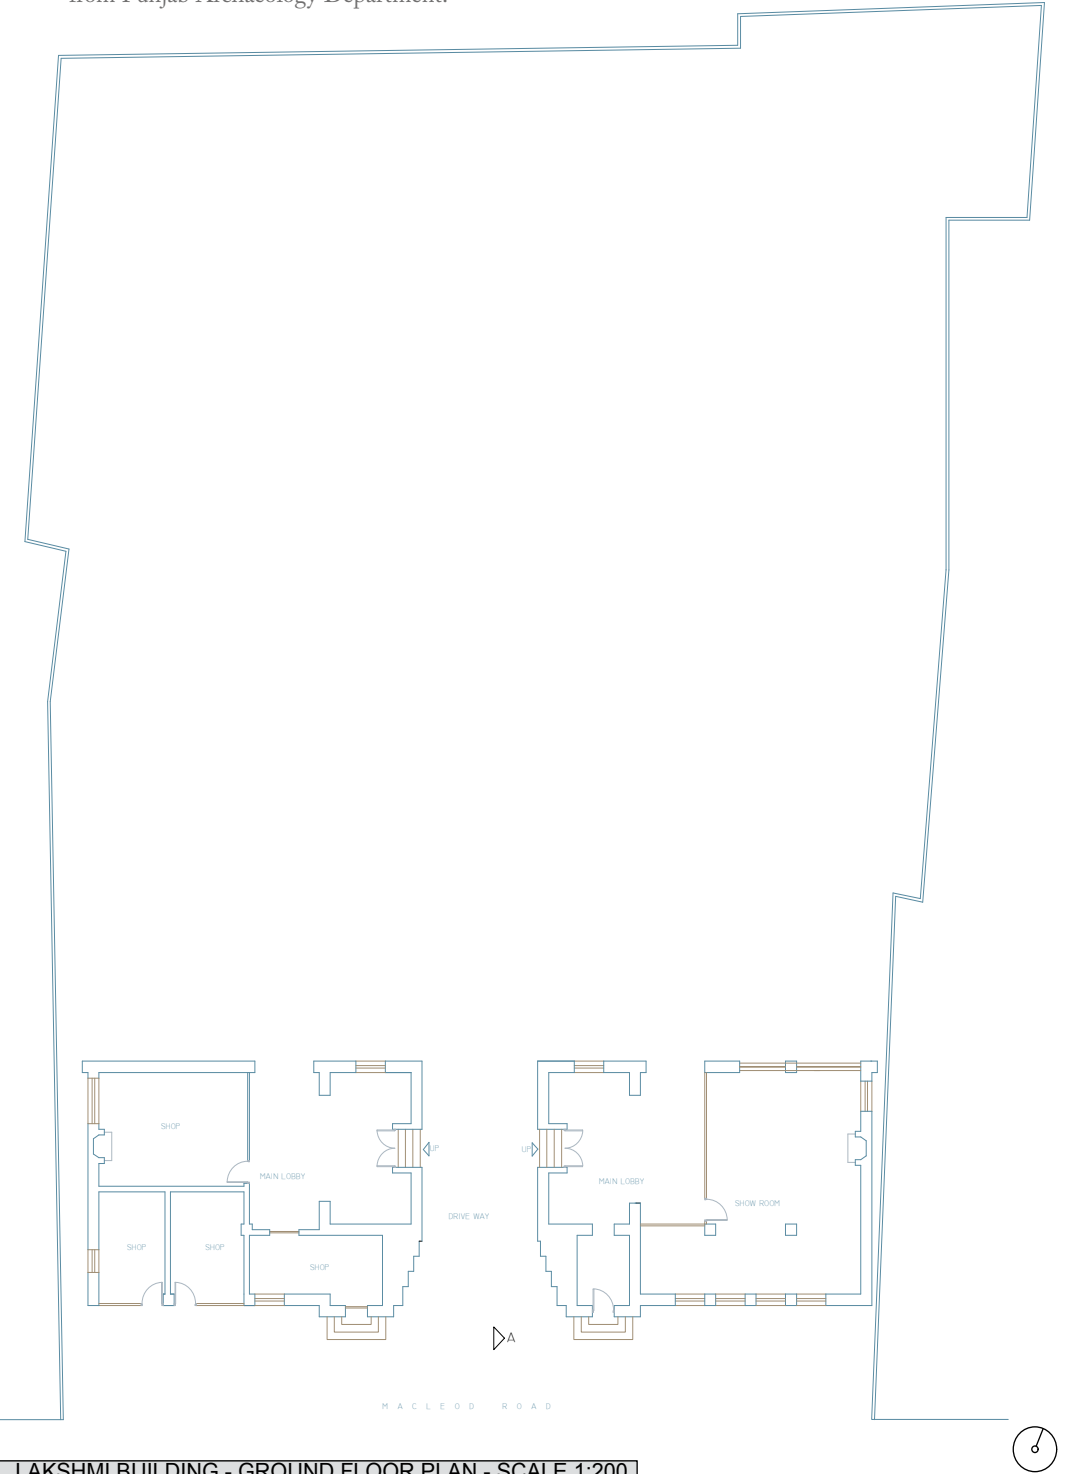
LAKSHMI BUILDING - ORIGINAL GROUND FLOOR PLAN, from Punjab Archaeology Department.
